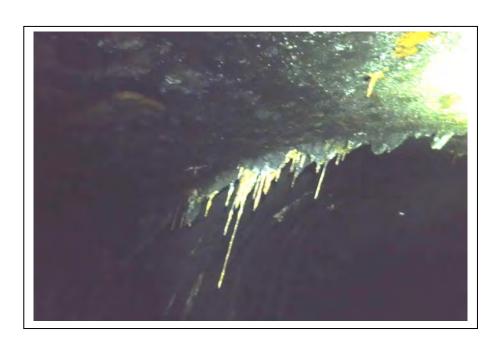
Tunnel back-filled to haunch level Sidewalls not examined after 3010m
